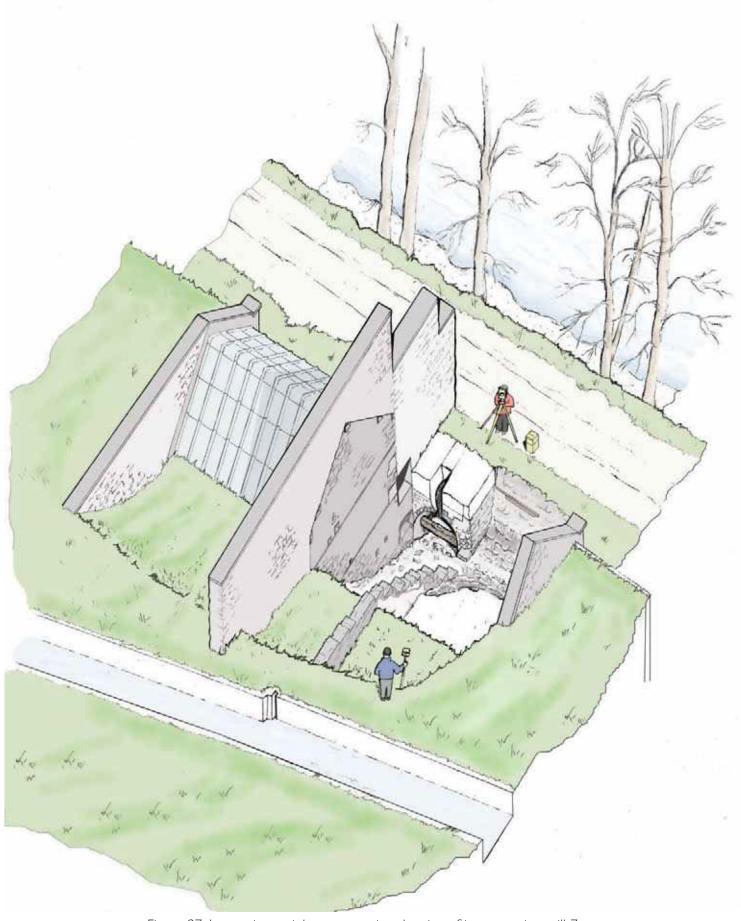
Isometric partial reconstruction drawing of incorporating mill 7 (Drawn by Matthew Bentley, © English Heritage)
